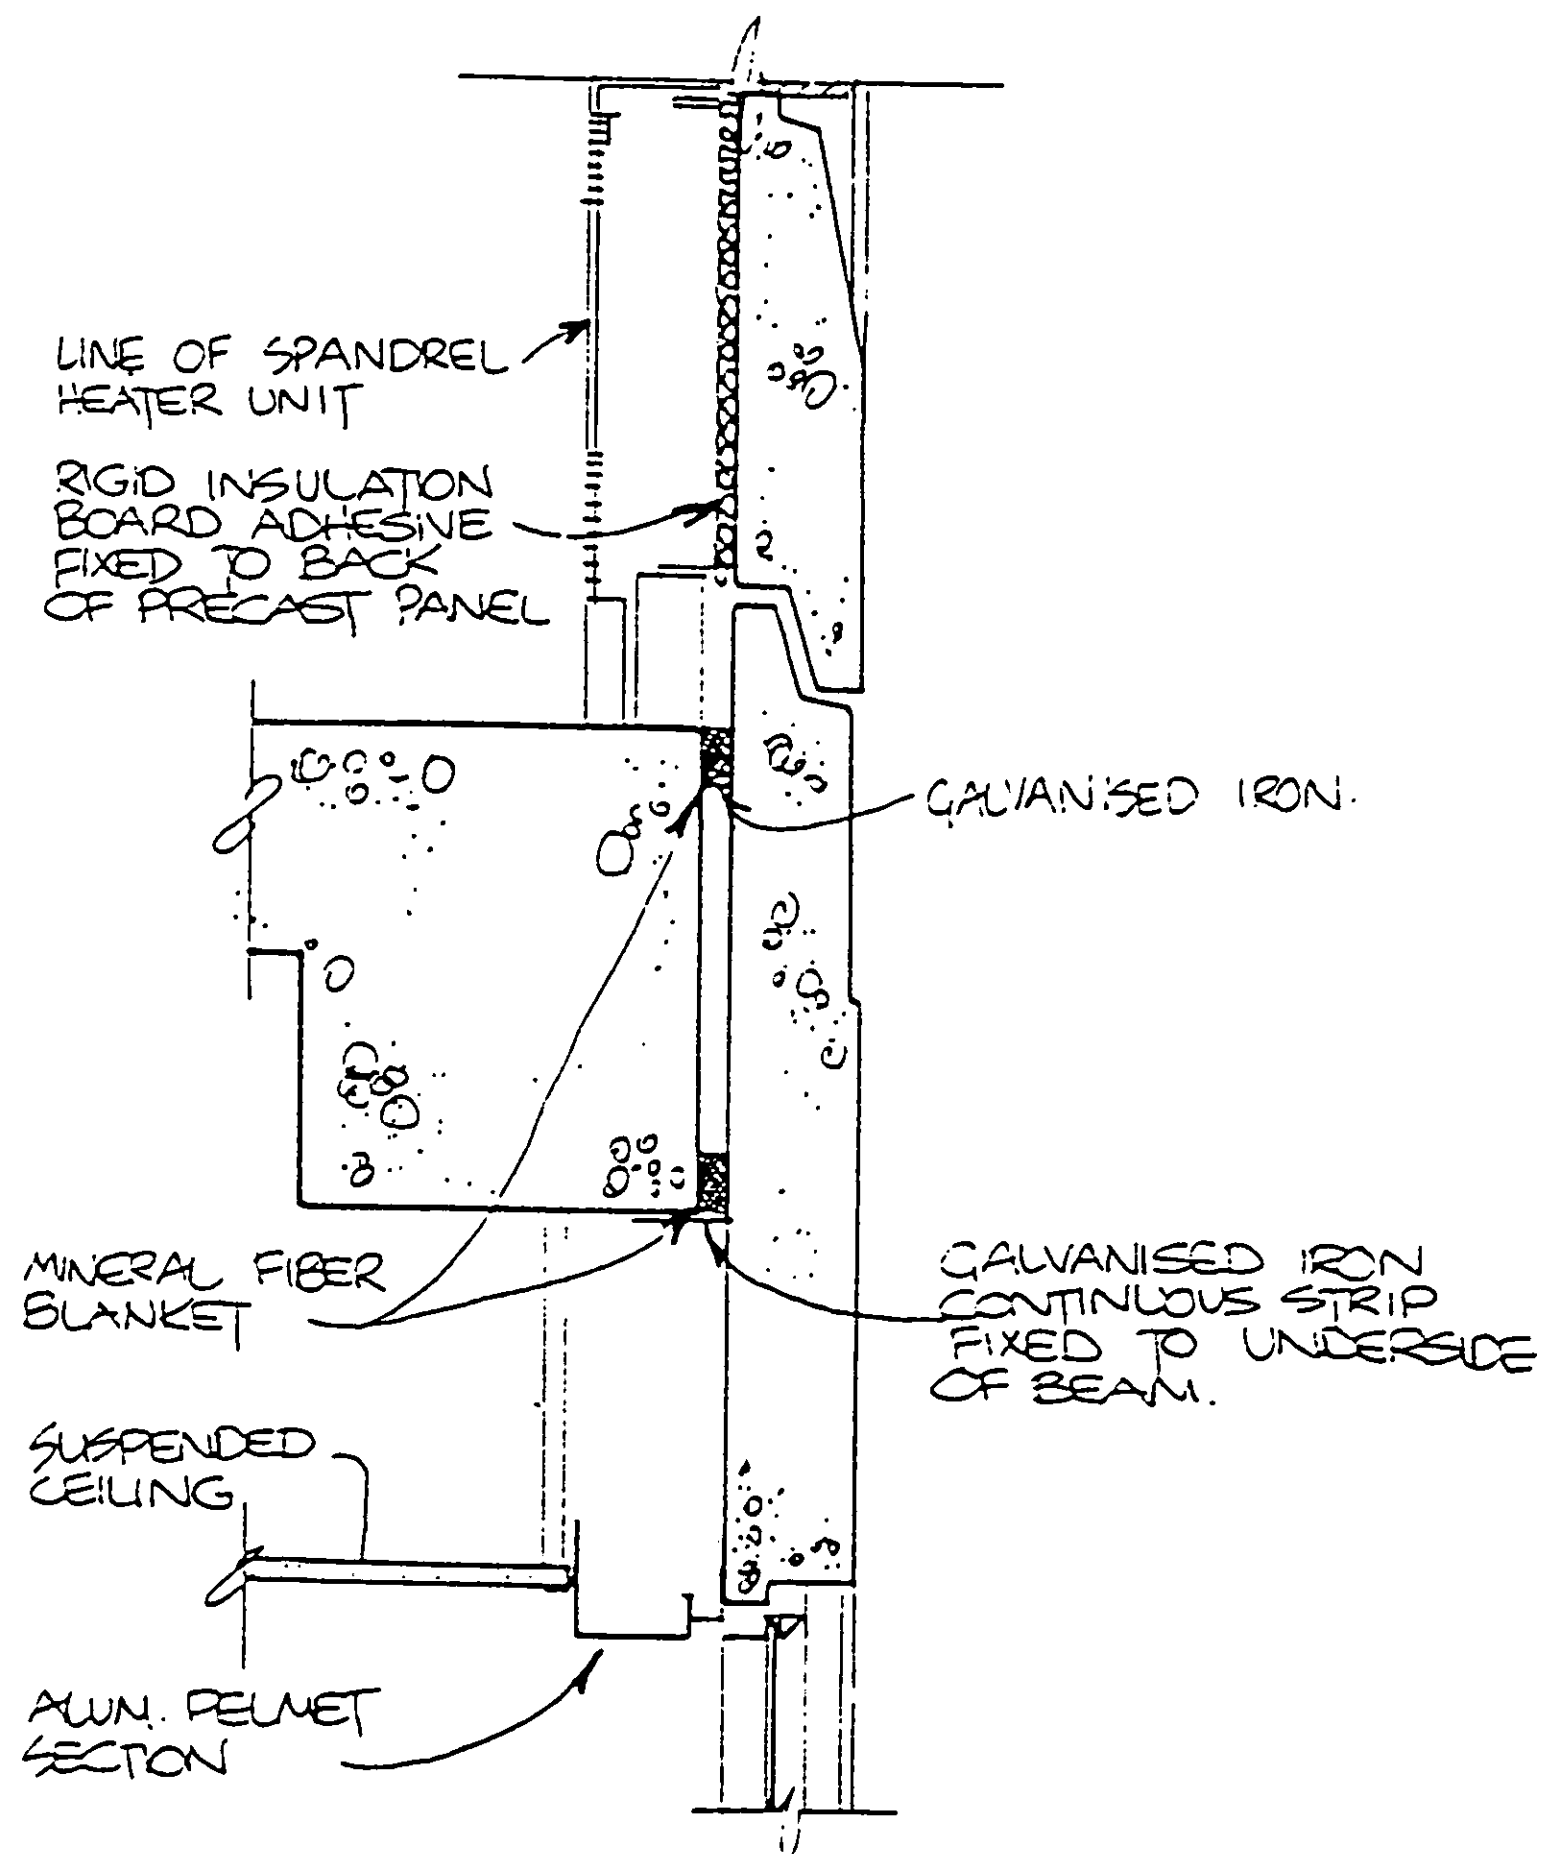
SECTION THROUGH CONCRETE FRAME,
